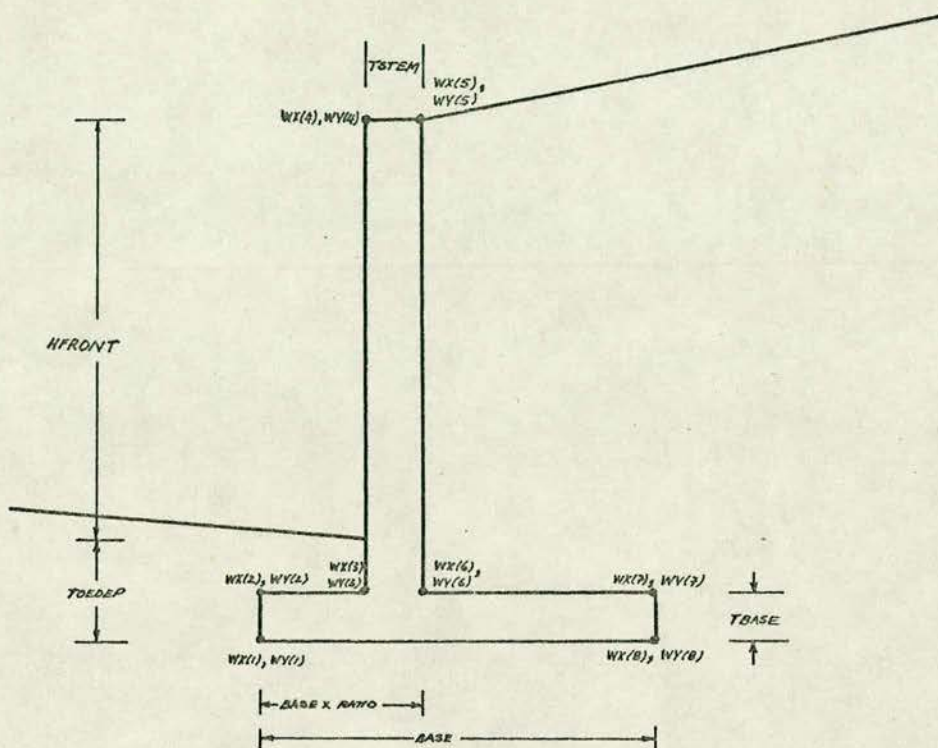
WALL SHAPE FOR AUTOMATIC CANTILEVER DESIGN
